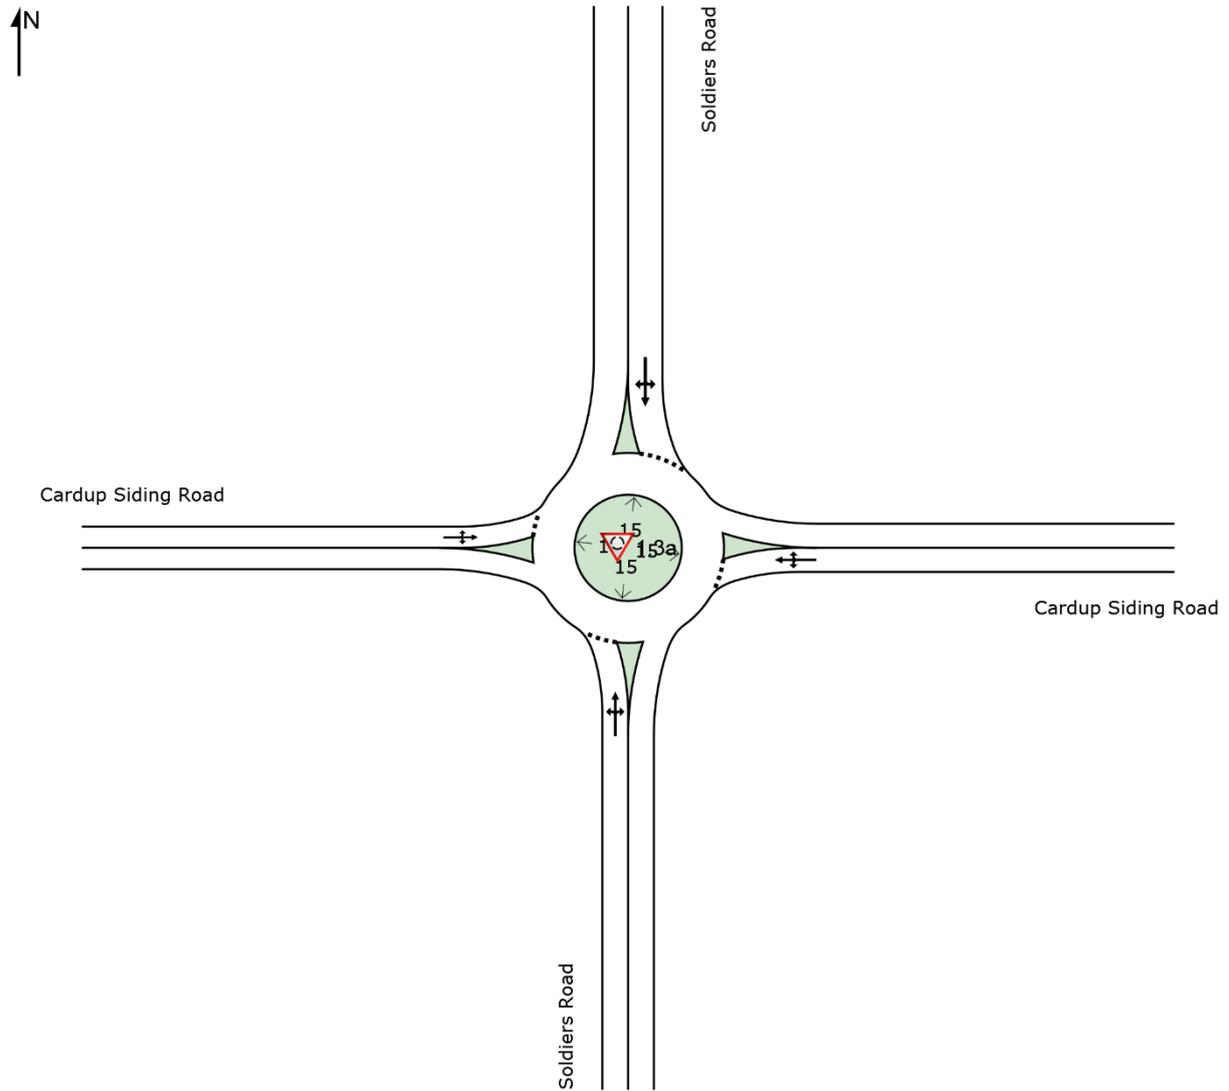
Soldiers Road / Cardup Siding Road - years 2021, 2023 and 2031 - current configuration
